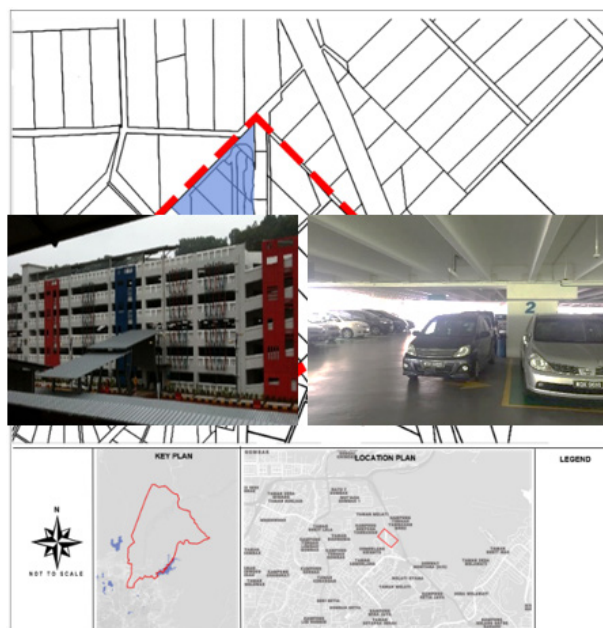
Location, building facade and layout of PnR facility at Gombak LRT terminal station
